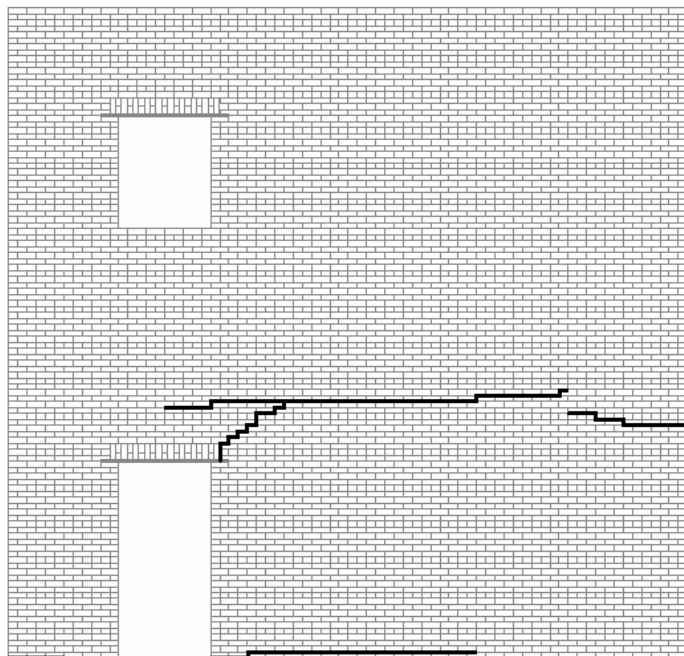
Crack locations in wall 1 after completed seismic testing.
